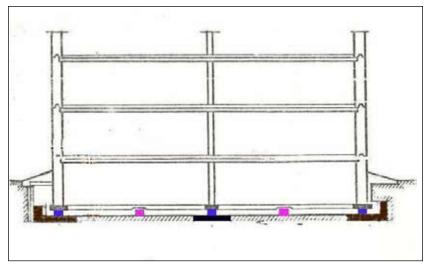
Building elevation showing the locations of sliding bearings (undercolumns) and vertical stops (center of spans) (WHE Report 76, Kyrgyzstan)
